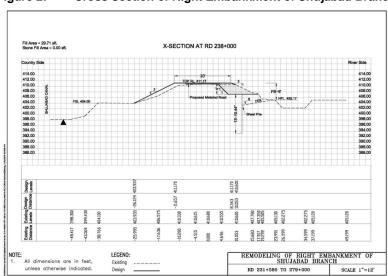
Cross Section of Right Embankment of Shujabad Branch
